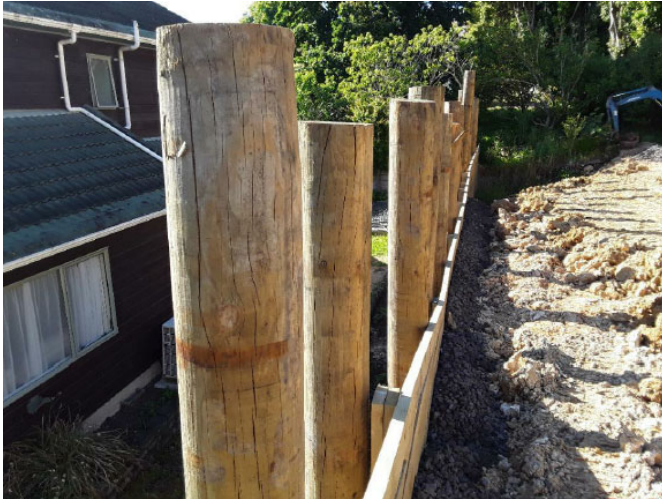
The Type 3 retaining wall as at 16 November 2018.³³
